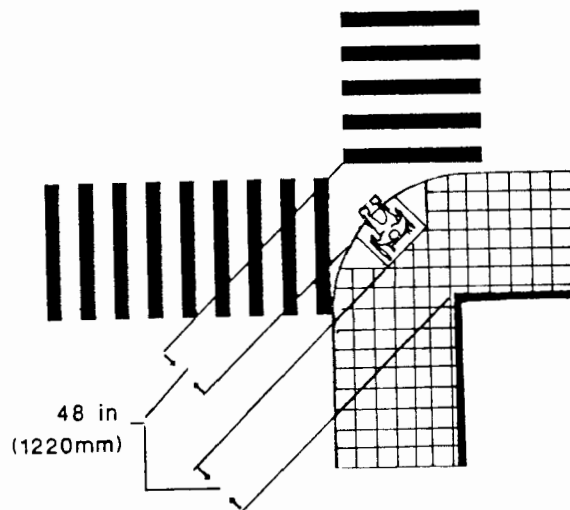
Recommended minimum overrun distances at top and bottom of curb ramps for safe wheelchair use.
